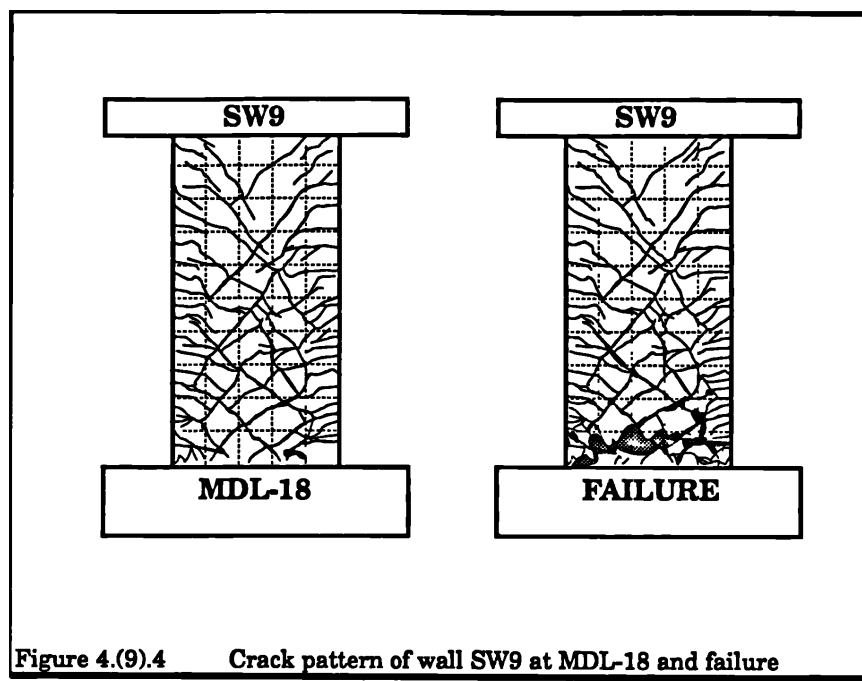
PilaSW9: DS2a - cracks at MDL-18 (spalling) and Failure
